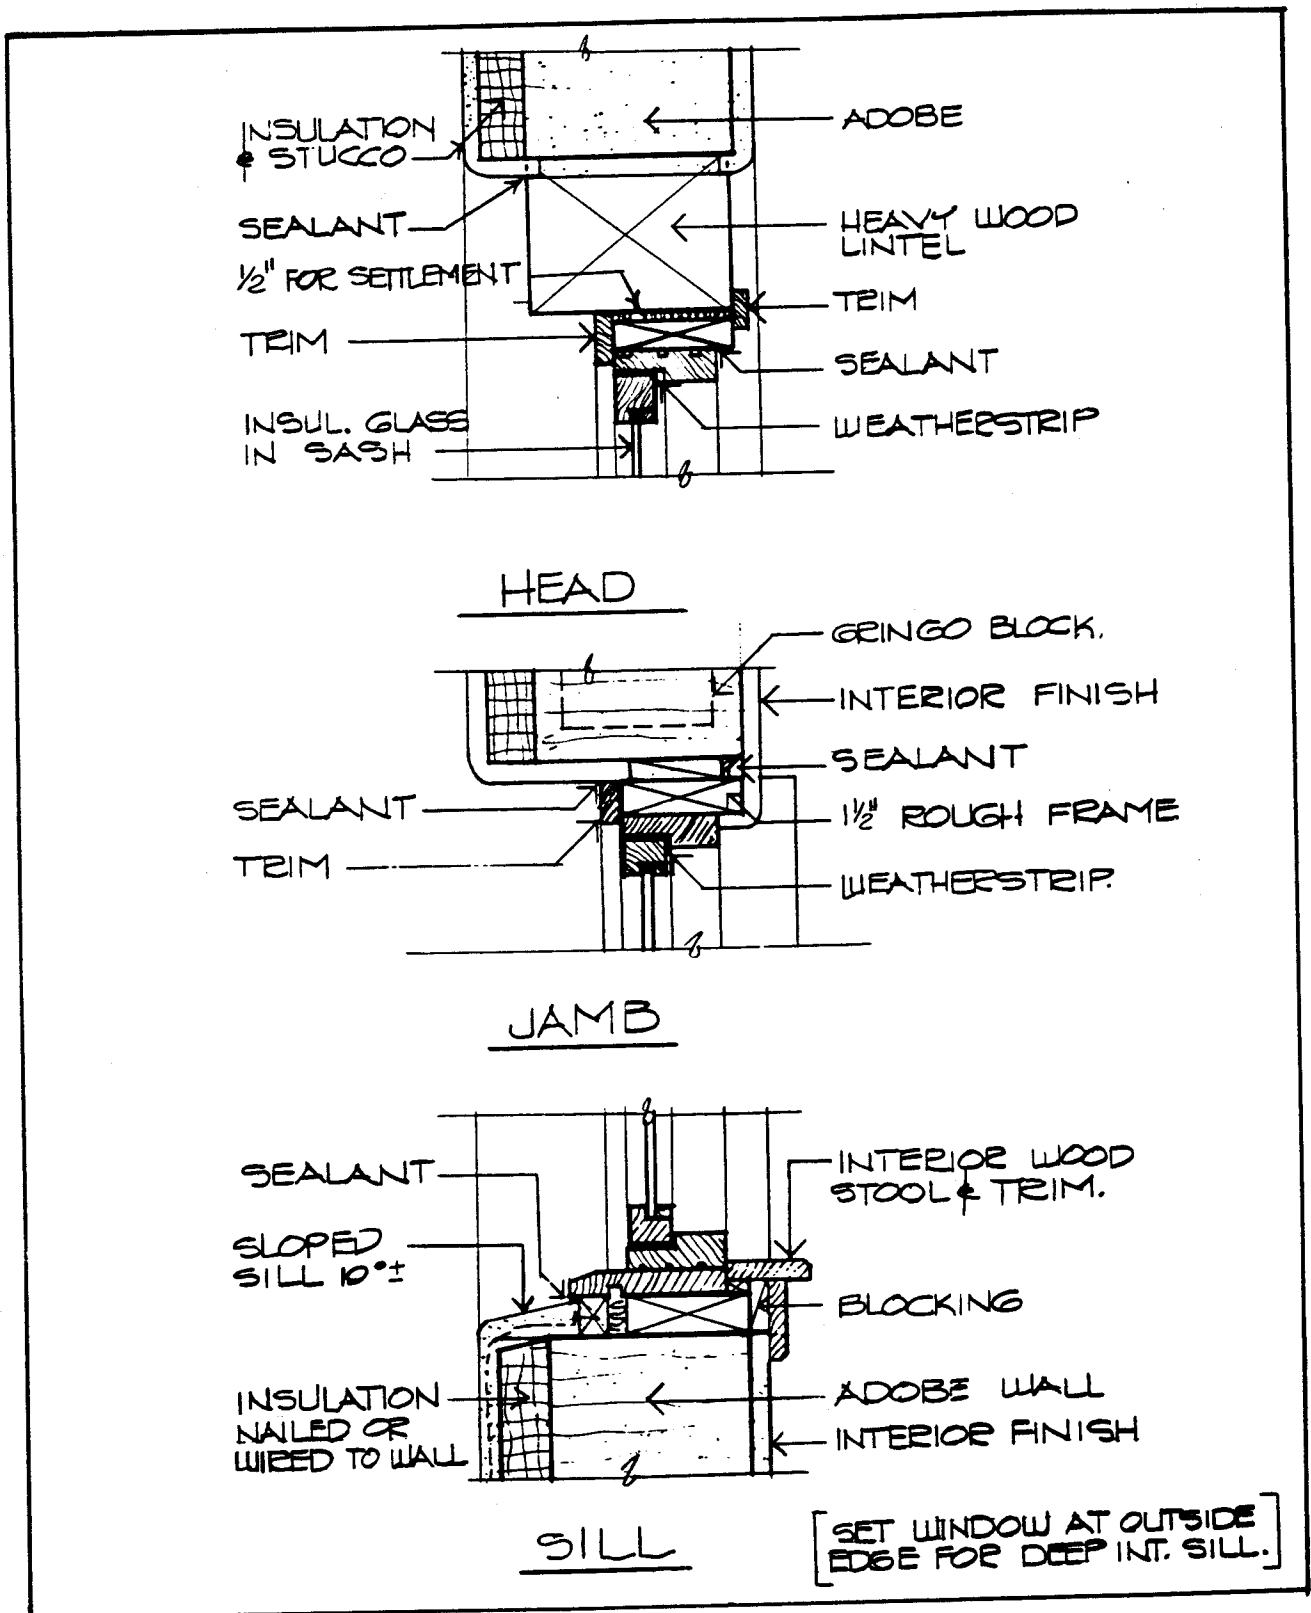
TYPICAL WOOD WINDOW DETAIL IN ADOBE WALL.
